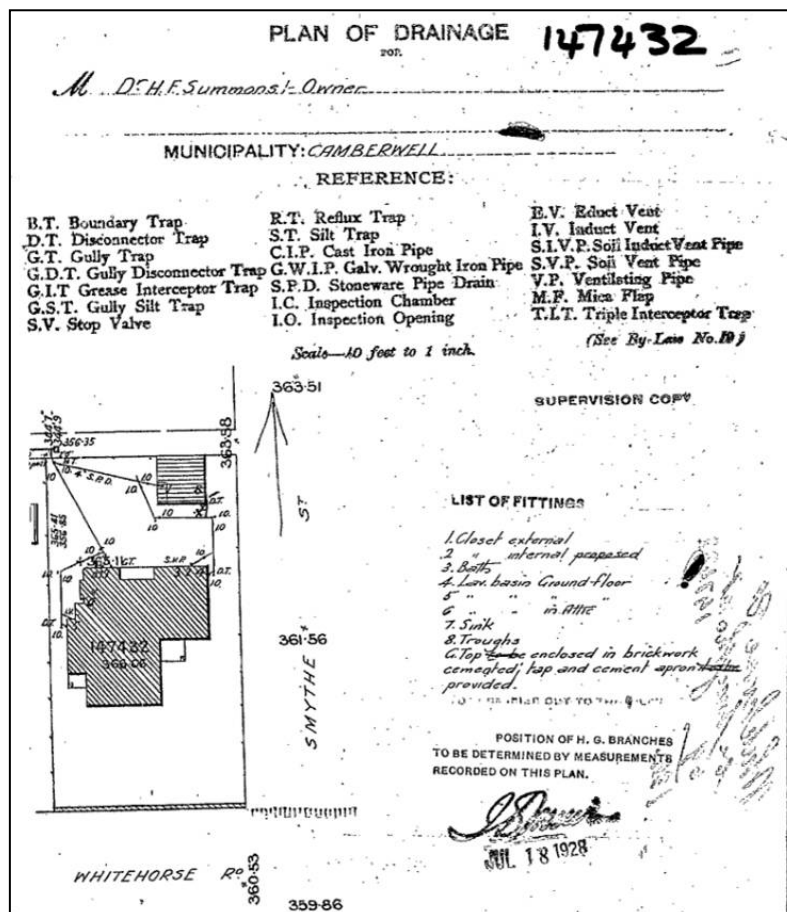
1928 copy of the property service plan showing the house and timber garage, with 'Dr H F Summons' indicated as the owner (top left of plan). Source: Yarra Valley Water
